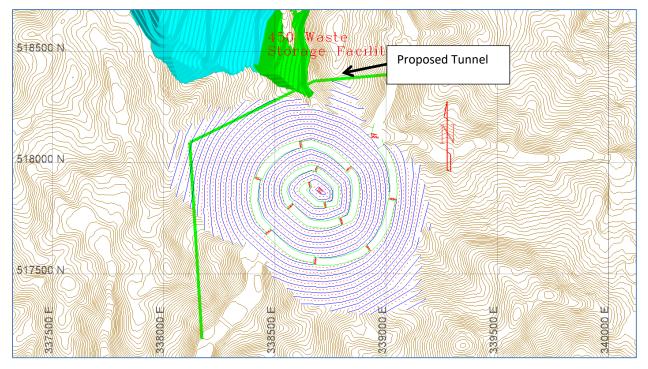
Rovina Creek Proposed Diversion Tunnel
